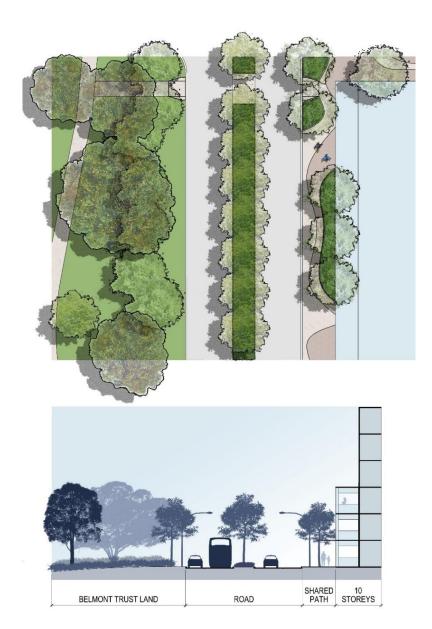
Stoneham Street Plan Extract and Indicative Cross-Section
